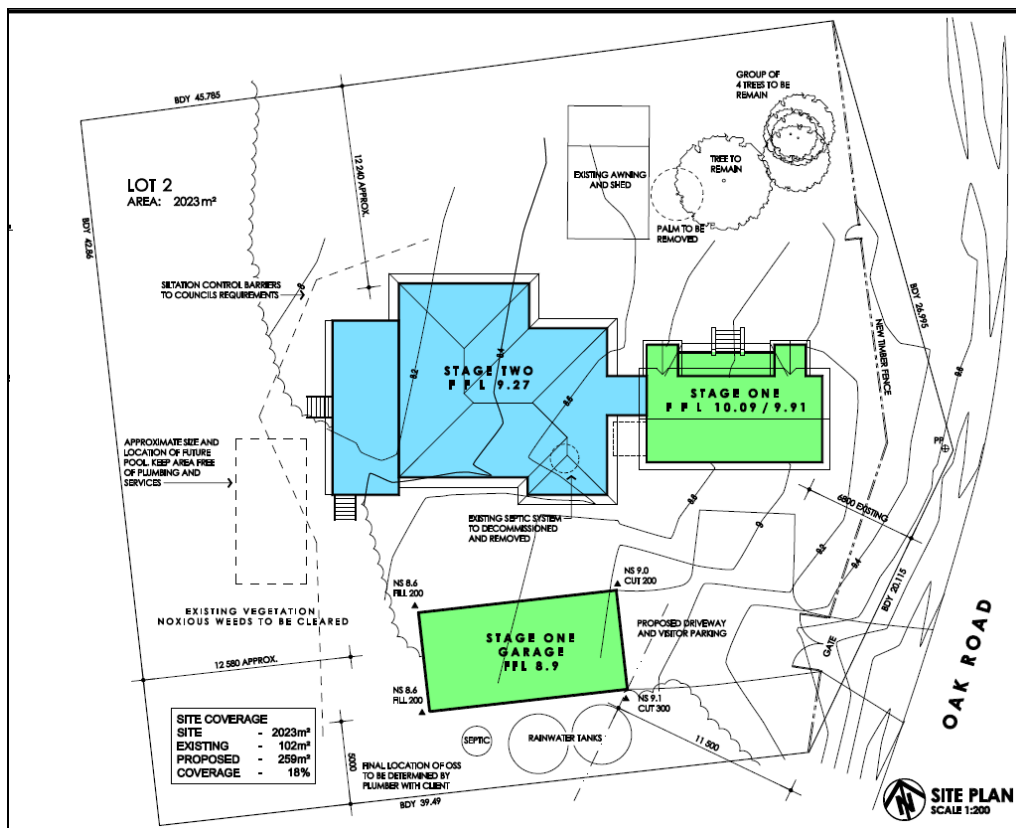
Site plan showing stage 1 and 2 of the proposal
